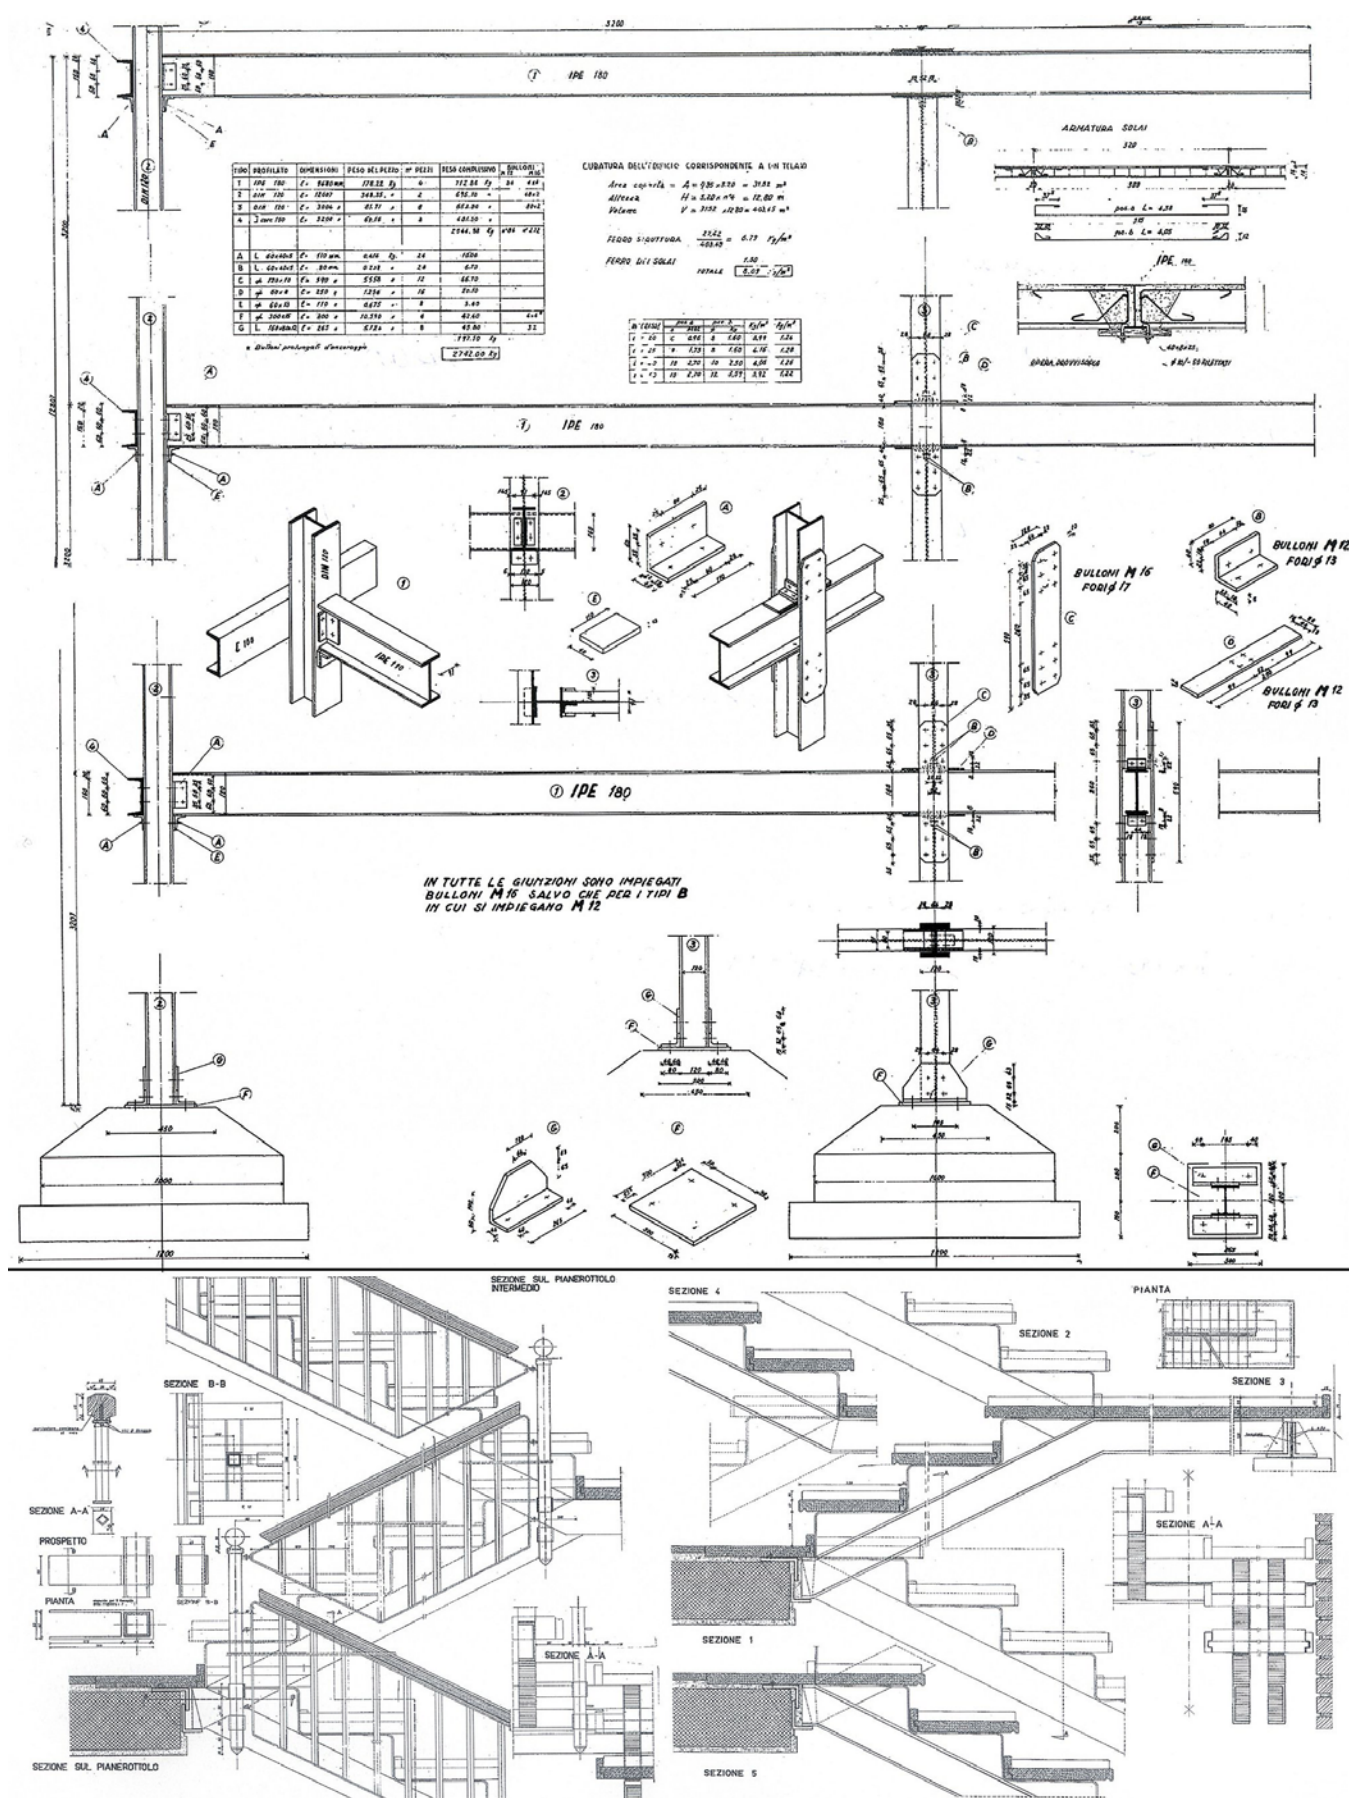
The building program developed by Colombini, Mandolesi, and Libera. Top: the typical hinged steel frame for the housing block. Bottom: the details of the staircase. Source: [23]
